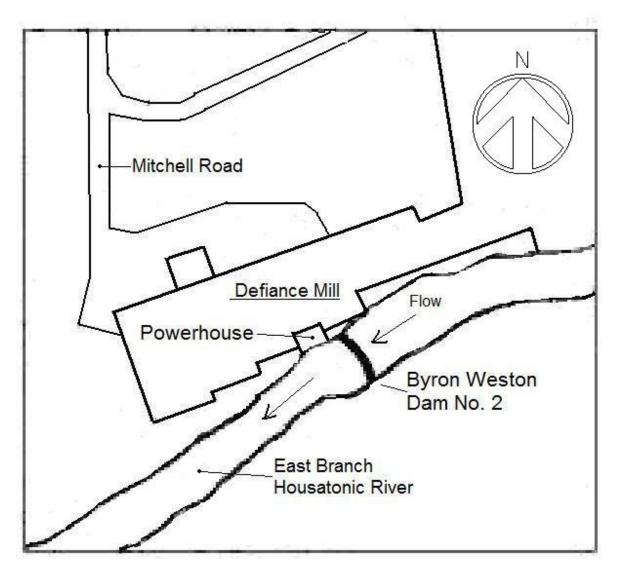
Byron Weston Project Site Plan (Source: Exemption application, as modified by staff)
